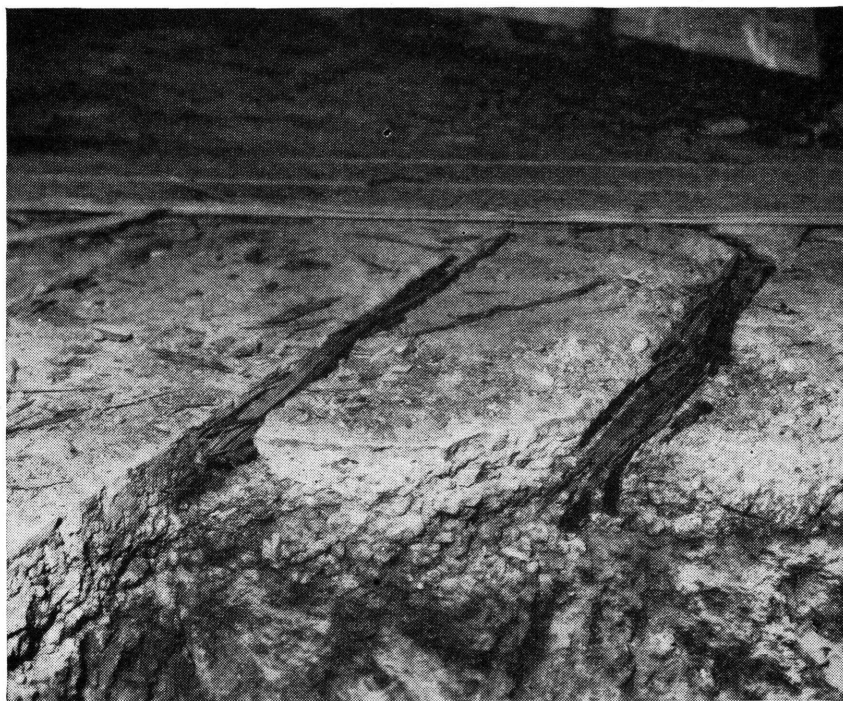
Termite damage to untreated sleepers embedded in concrete flooring.
